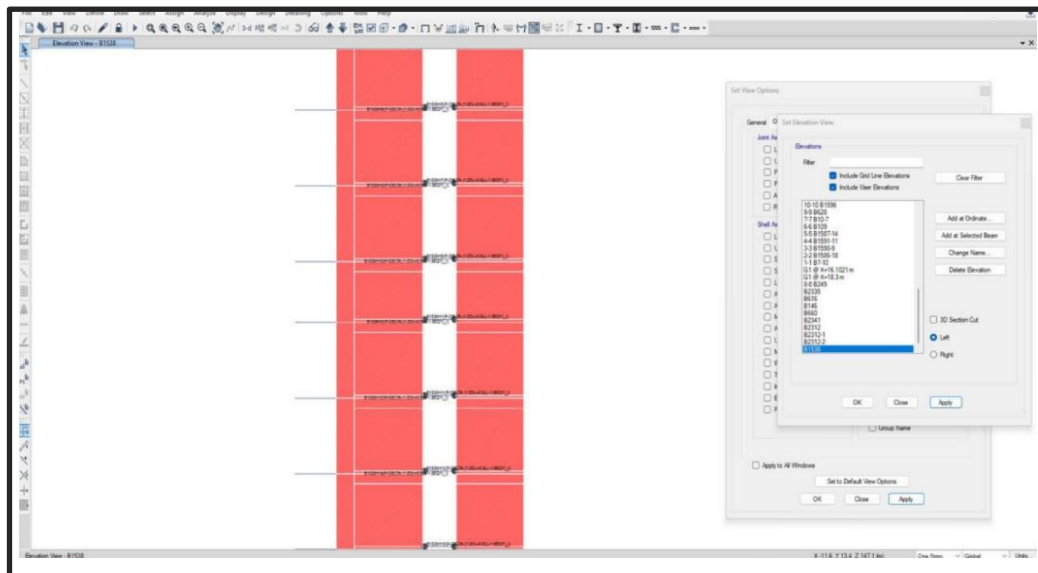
ELEVATION OF COUPLING BEAMS PLASTIC HINGE MODELLED IN ETABS
